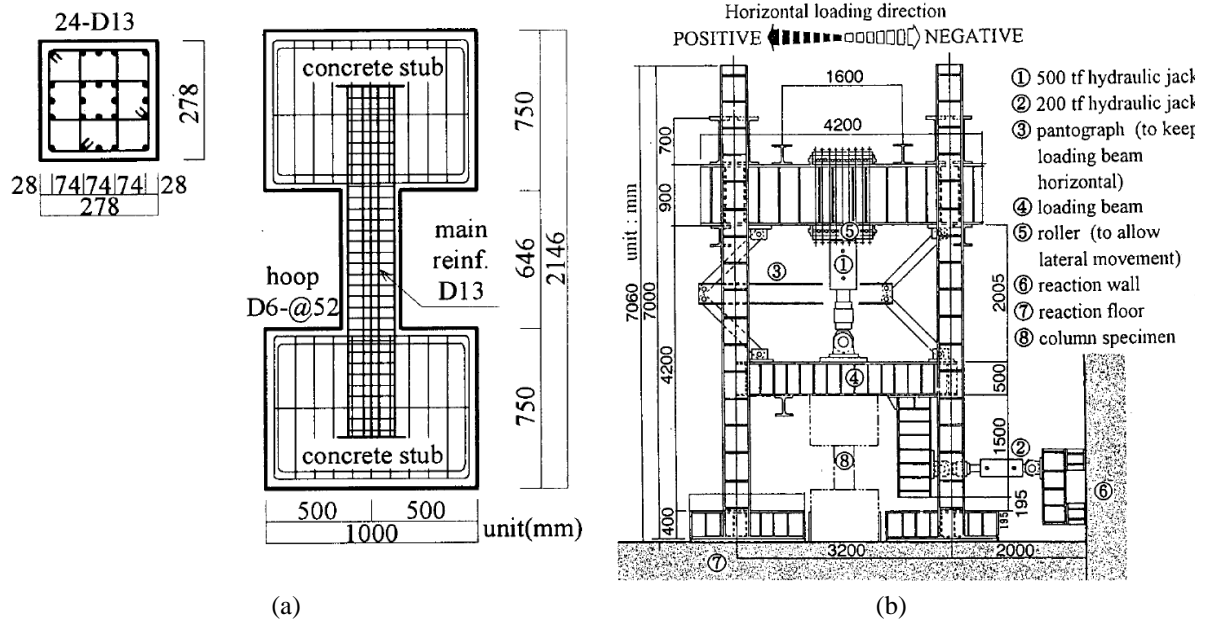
(a) Specimen C-2 details and (b) test set-up. [43]
